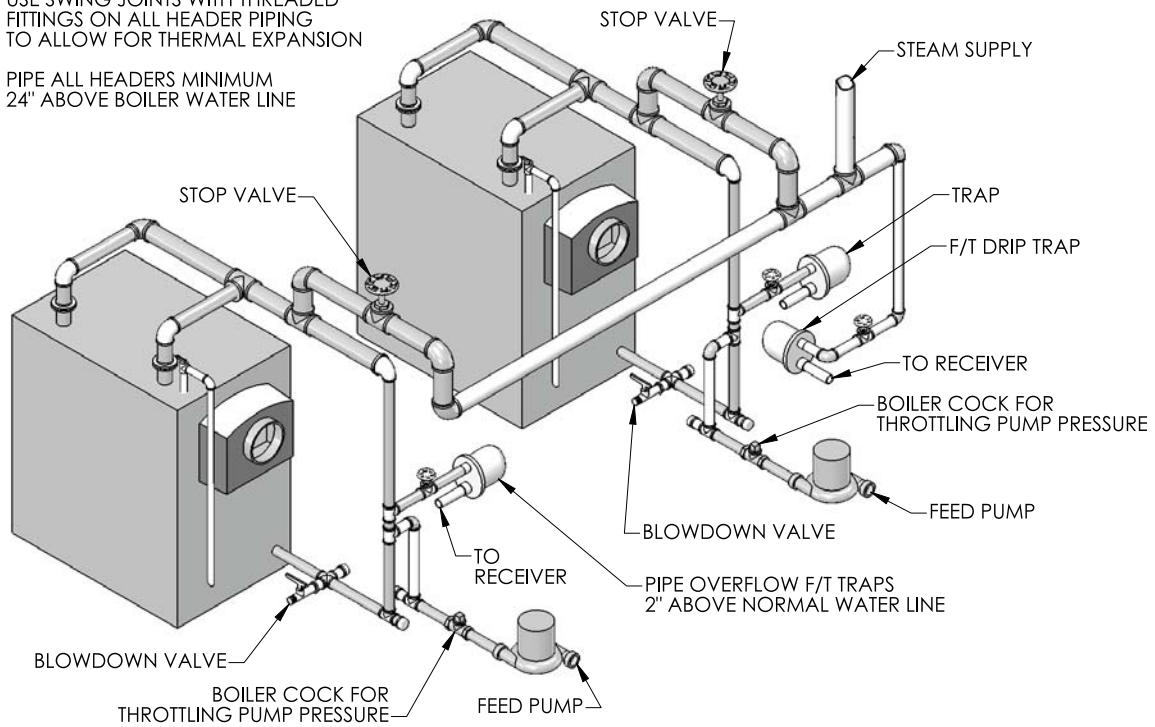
Multiple Steam Boiler Piping - Pumped Return
